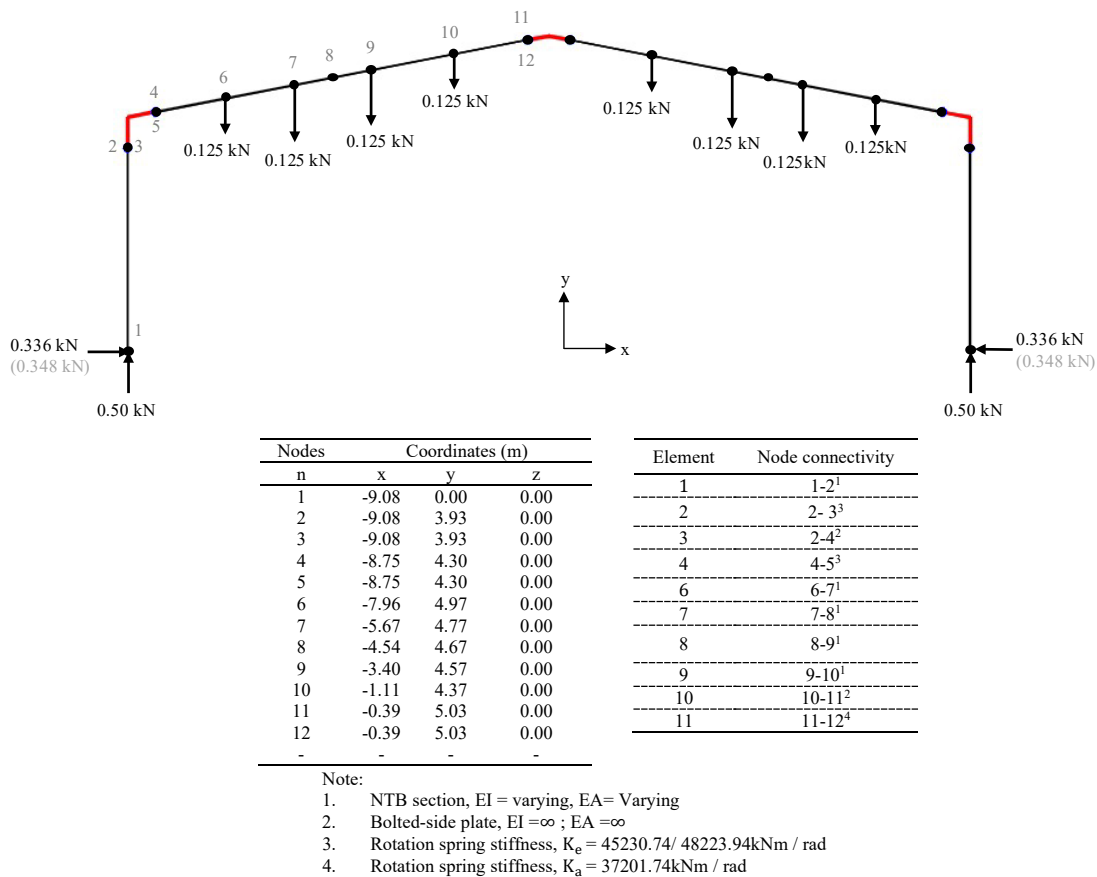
Beam model for the NTB portal frame with bolted-side plate joints
